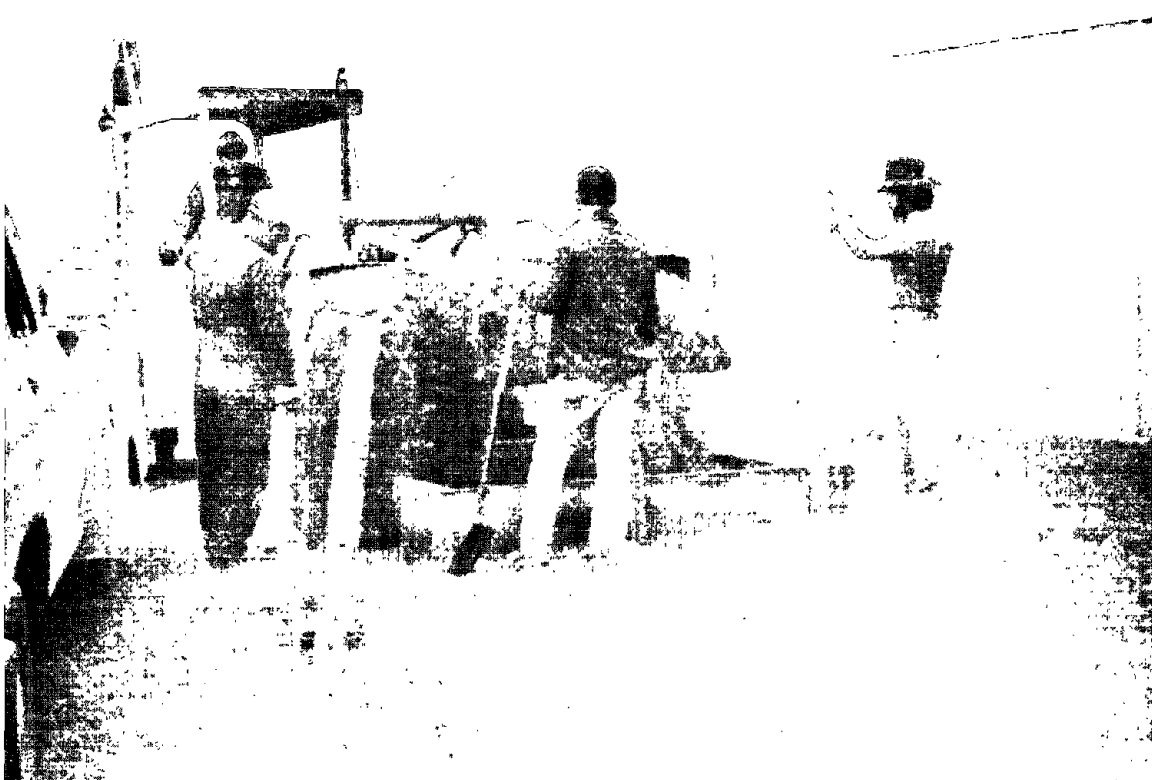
Constructing the form for the foundation of the South Water Treatment Plant.
